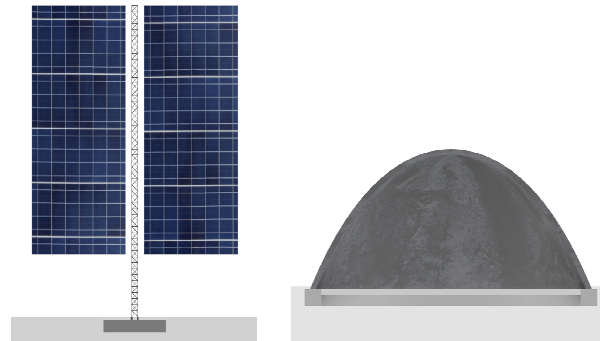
Potential Foundation Systems: Mat Foundation for Tall Lunar Tower (left) and Ring Beam Footing for Catenary Dome (right)
